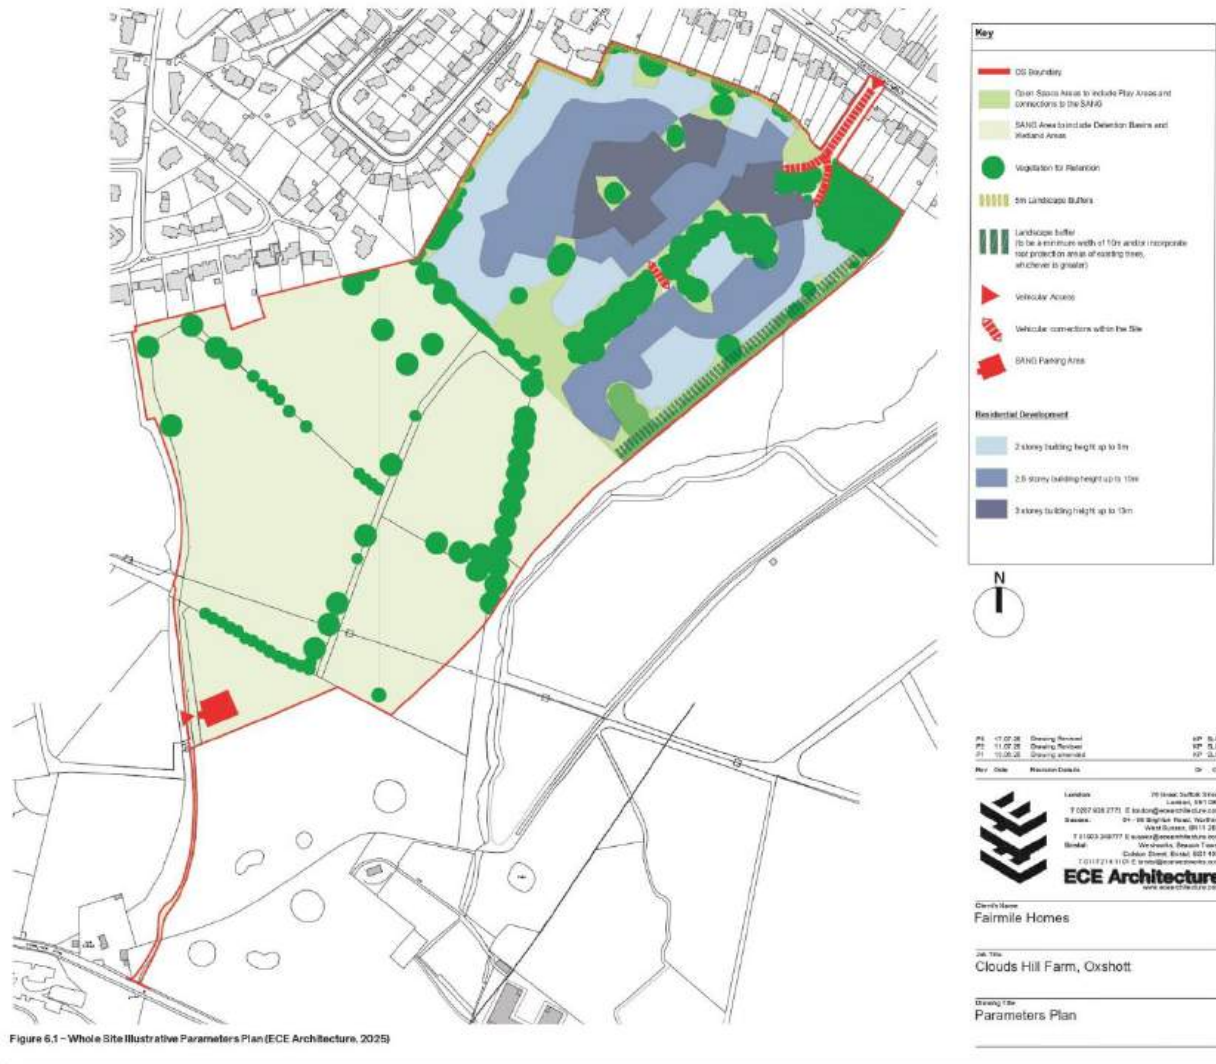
Whole Site Illustrative Parameters Plan (ECE Architecture, 2025)
